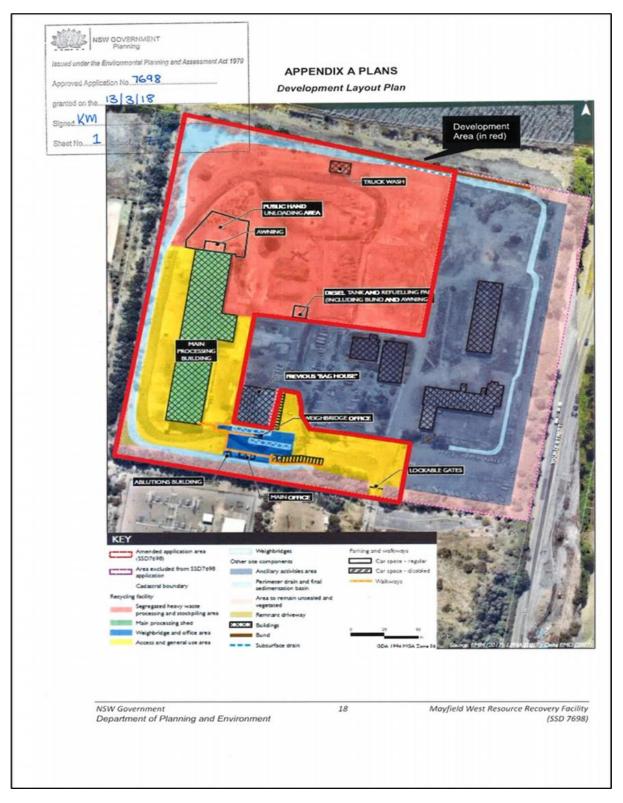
SSD 7698 Proposed Modification to the Development Layout Plan
